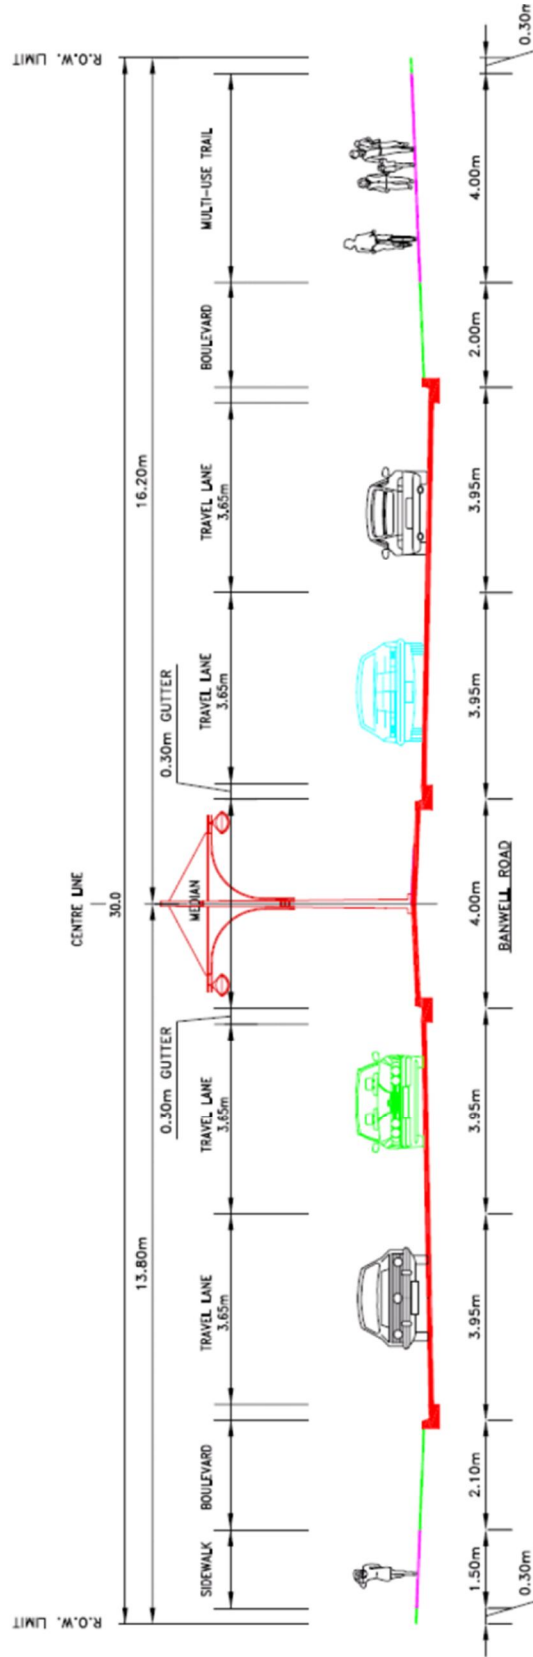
Recommended Cross-Section for County Road 43 / Banwell Road
